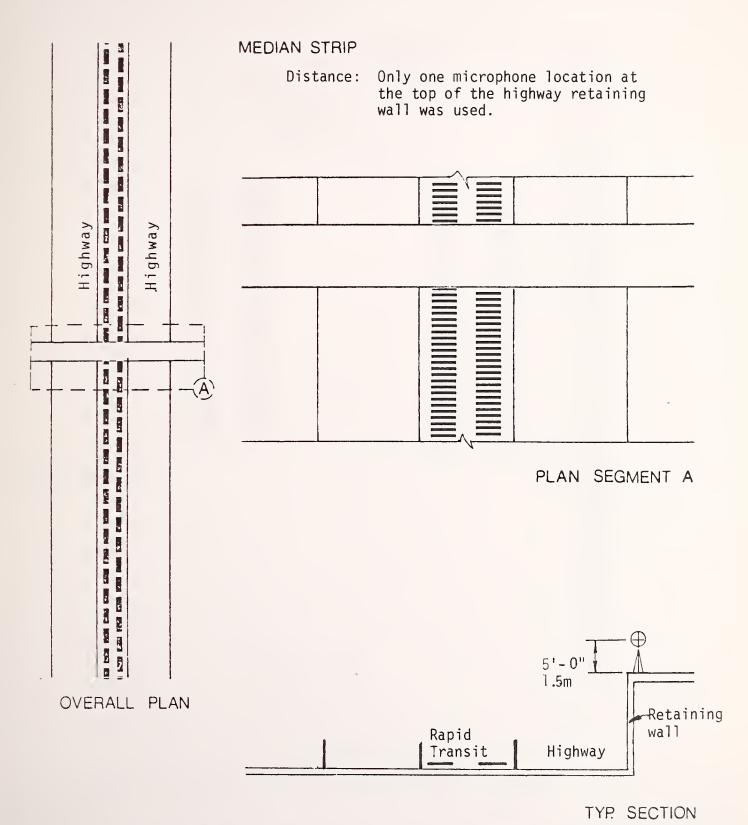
Wayside Measurement Location Adjacent to Median Strip
